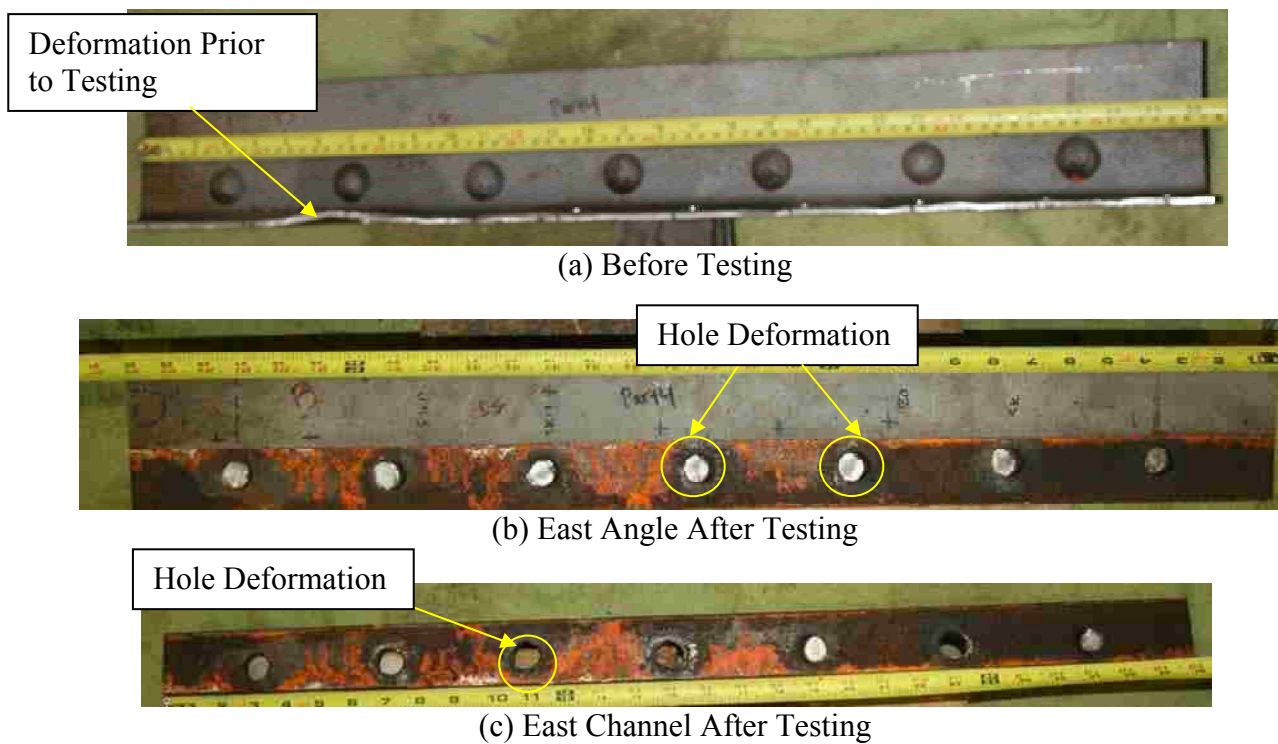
East Guardrail Rivet Hole Deformation – Specimen 7R
